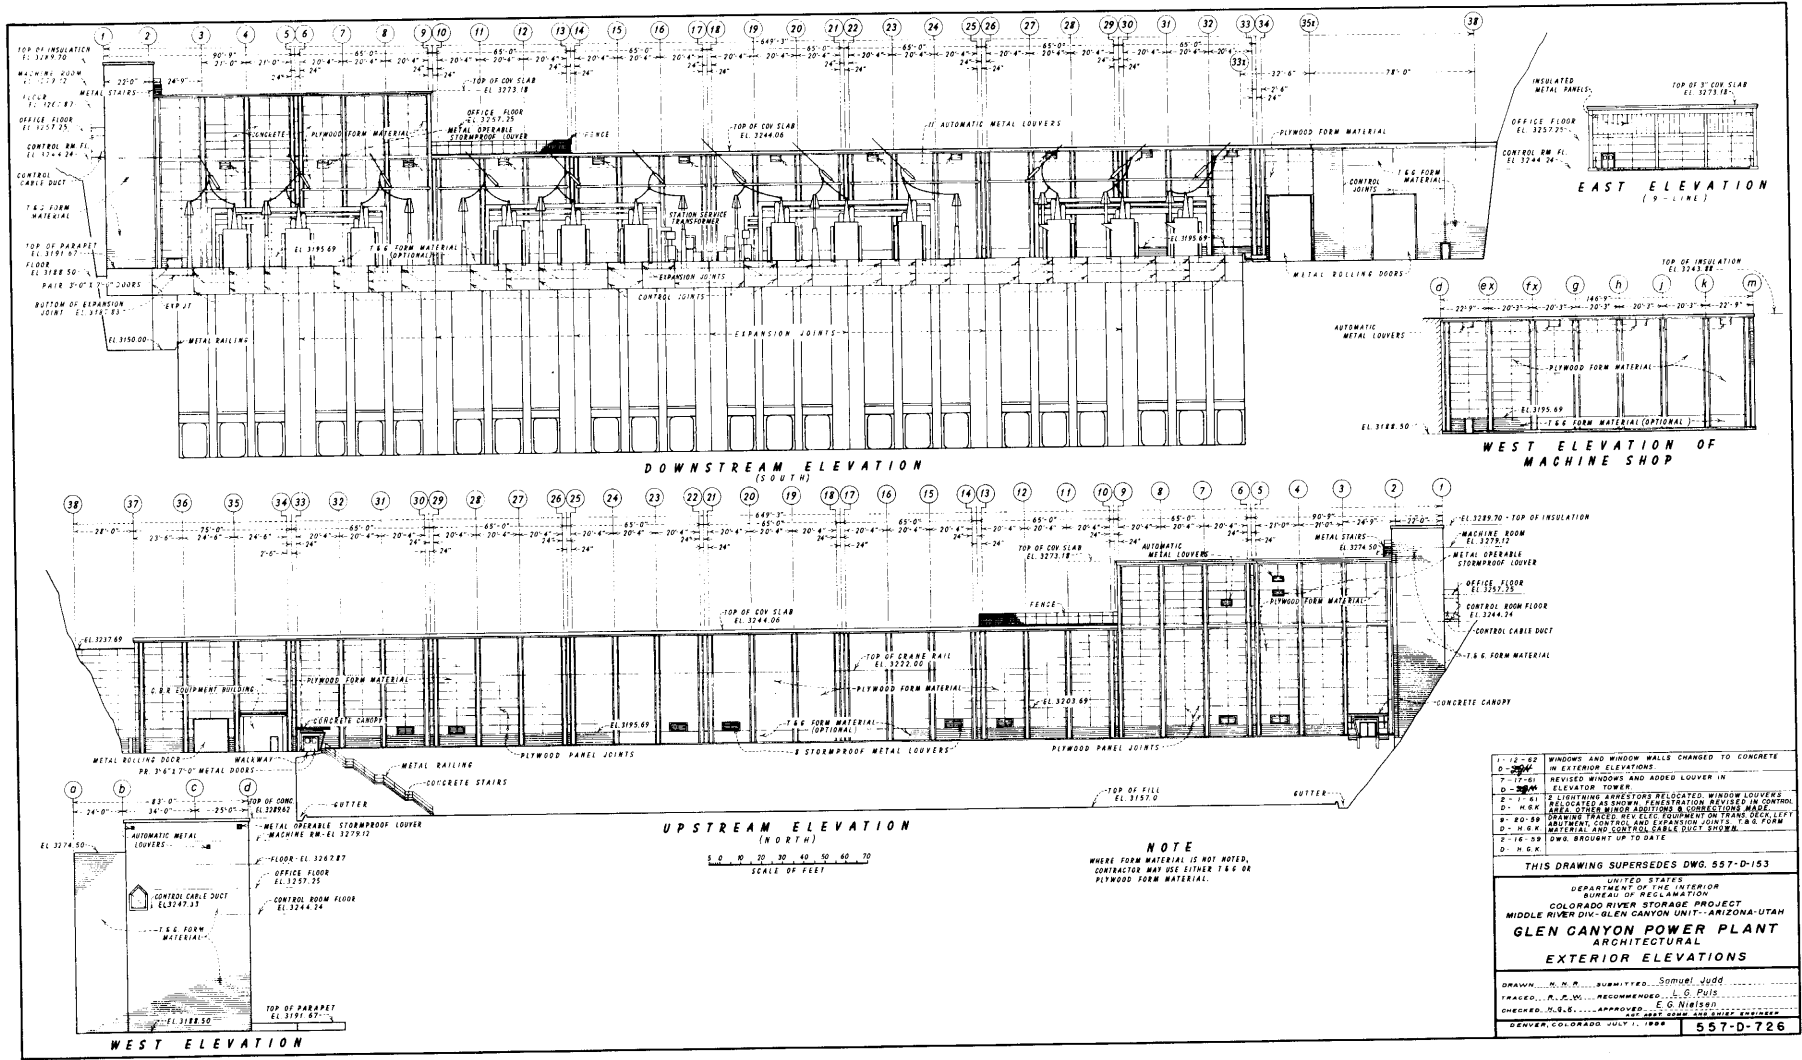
Powerplant exterior elevations—Architectural treatment.
